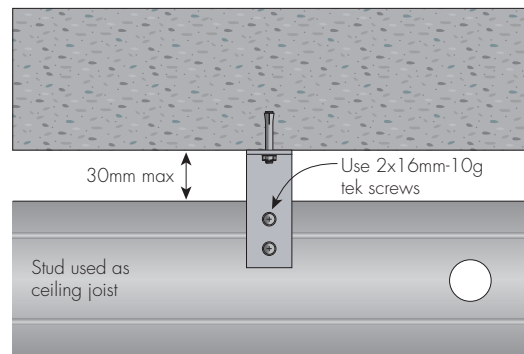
Ceiling Continuous Joist to Angle Bracket
